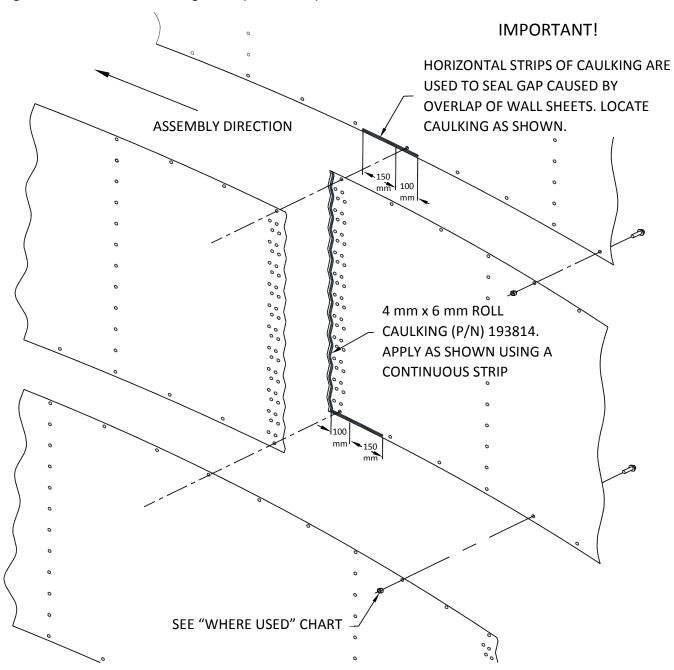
Wall Sheet Caulking Detail (inside view) — Metric
